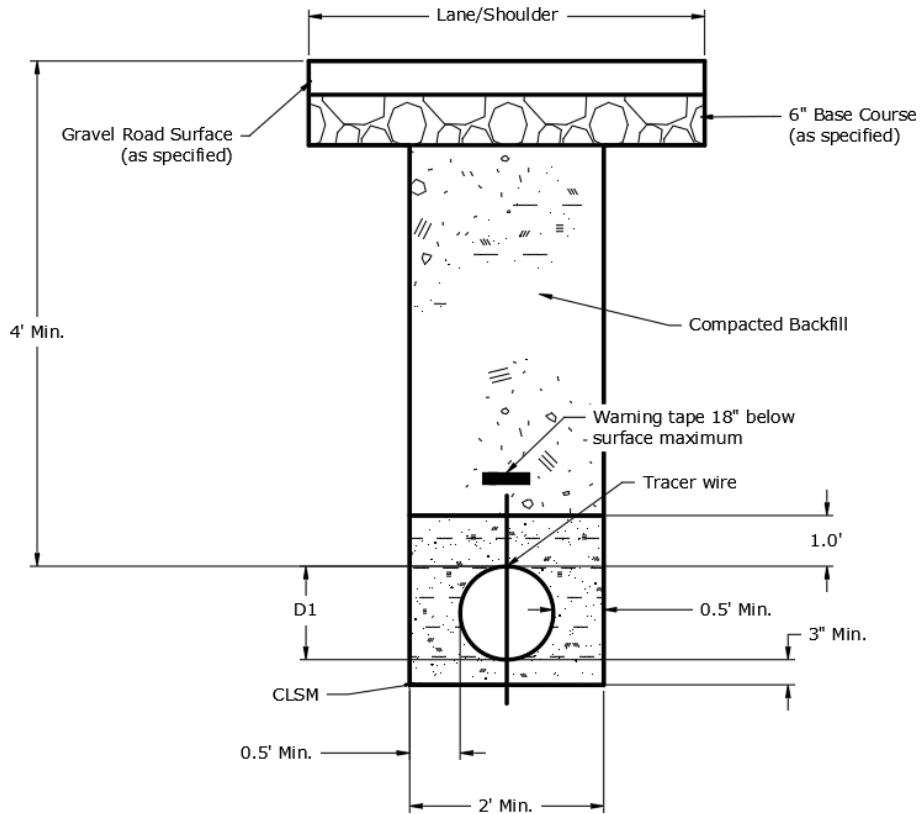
Phase 2 Pipe Trench and Bedding Configuration for Unpaved Road Installation
